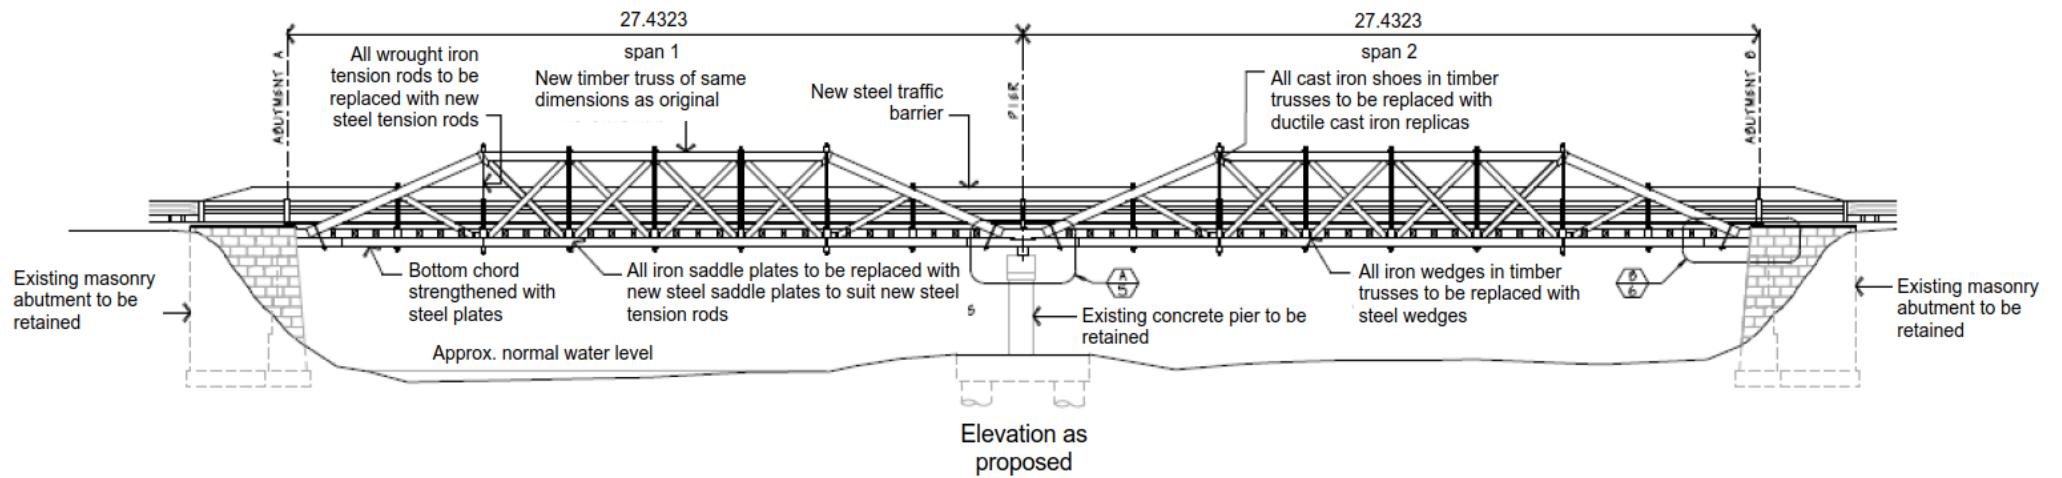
Long section, proposed upgrade of McKanes Bridge
